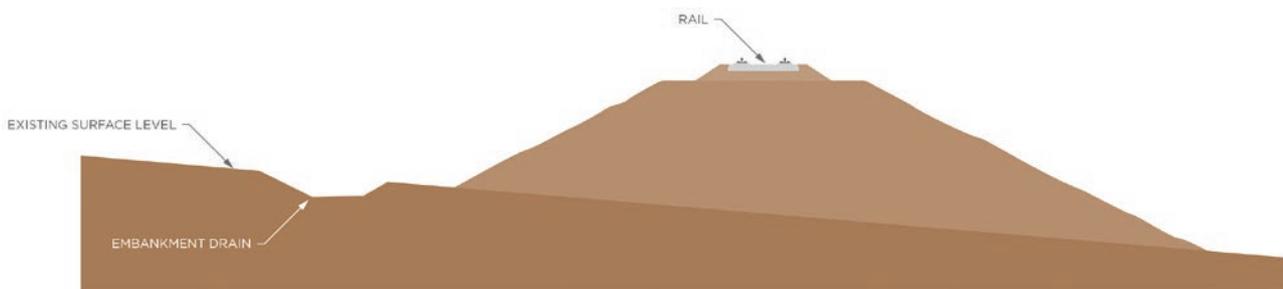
TYPICAL LONGITUDINAL DRAINAGE FOR RAIL FORMATION ON TOP OF EMBANKMENT
